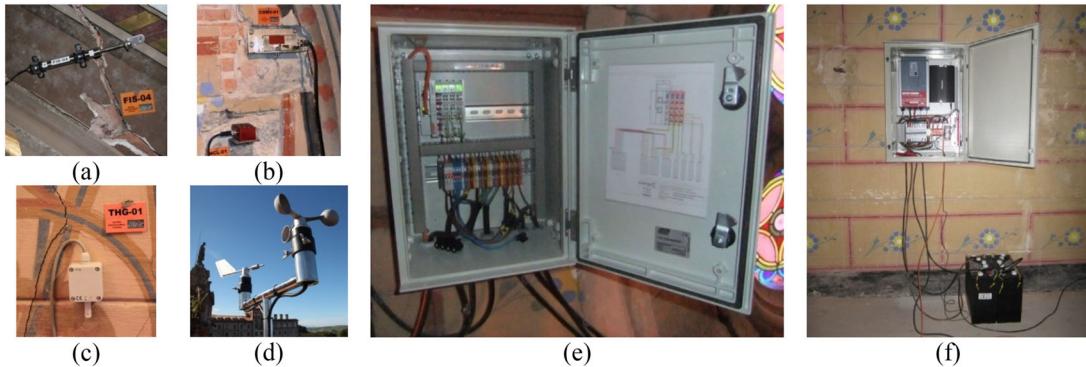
Examples of sensors deployed. (a) Crack meter FIS-04. (b) Tape extensometer CONV-01 and servo-inclinometer INCL-01. (c) Indoor thermo-hygrometer THG-01. (d) Wind vane and anemometer. (e) Remote terminal unit #2. (f) Master terminal unit with auxiliary batteries at the bottom.
